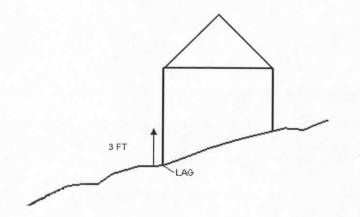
Three-Foot Dry Floodproofing Limitation
